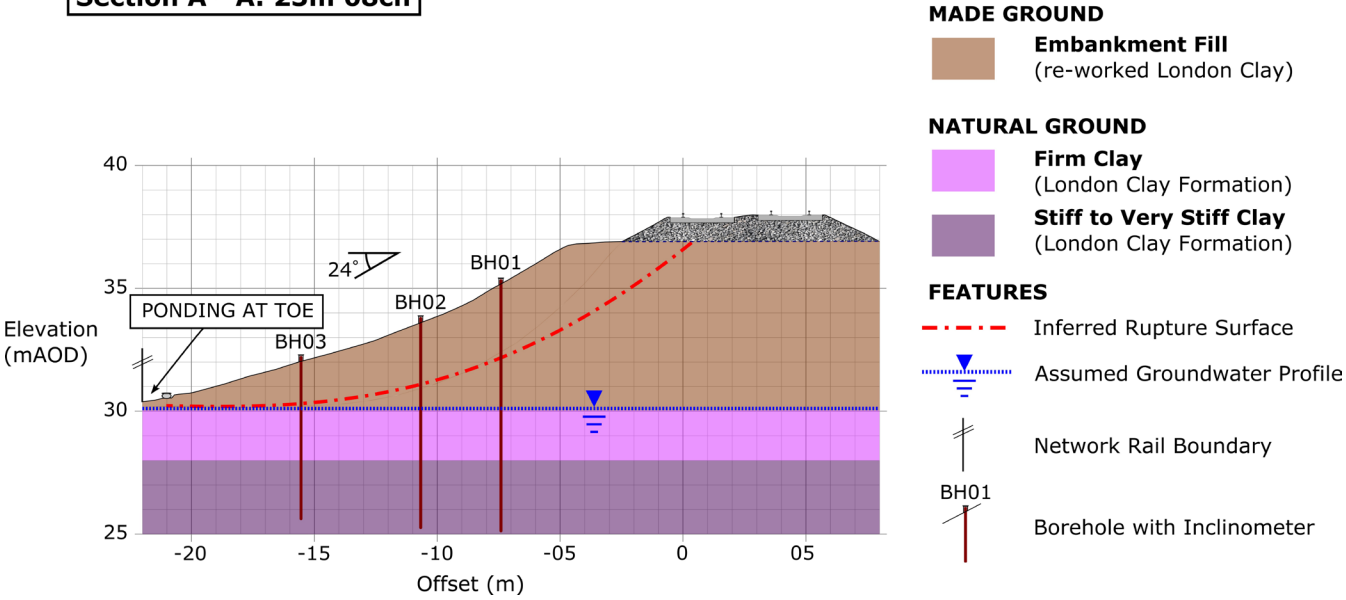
B: Cross Section showing failure zone pre-intervention (23ml 68ch)
